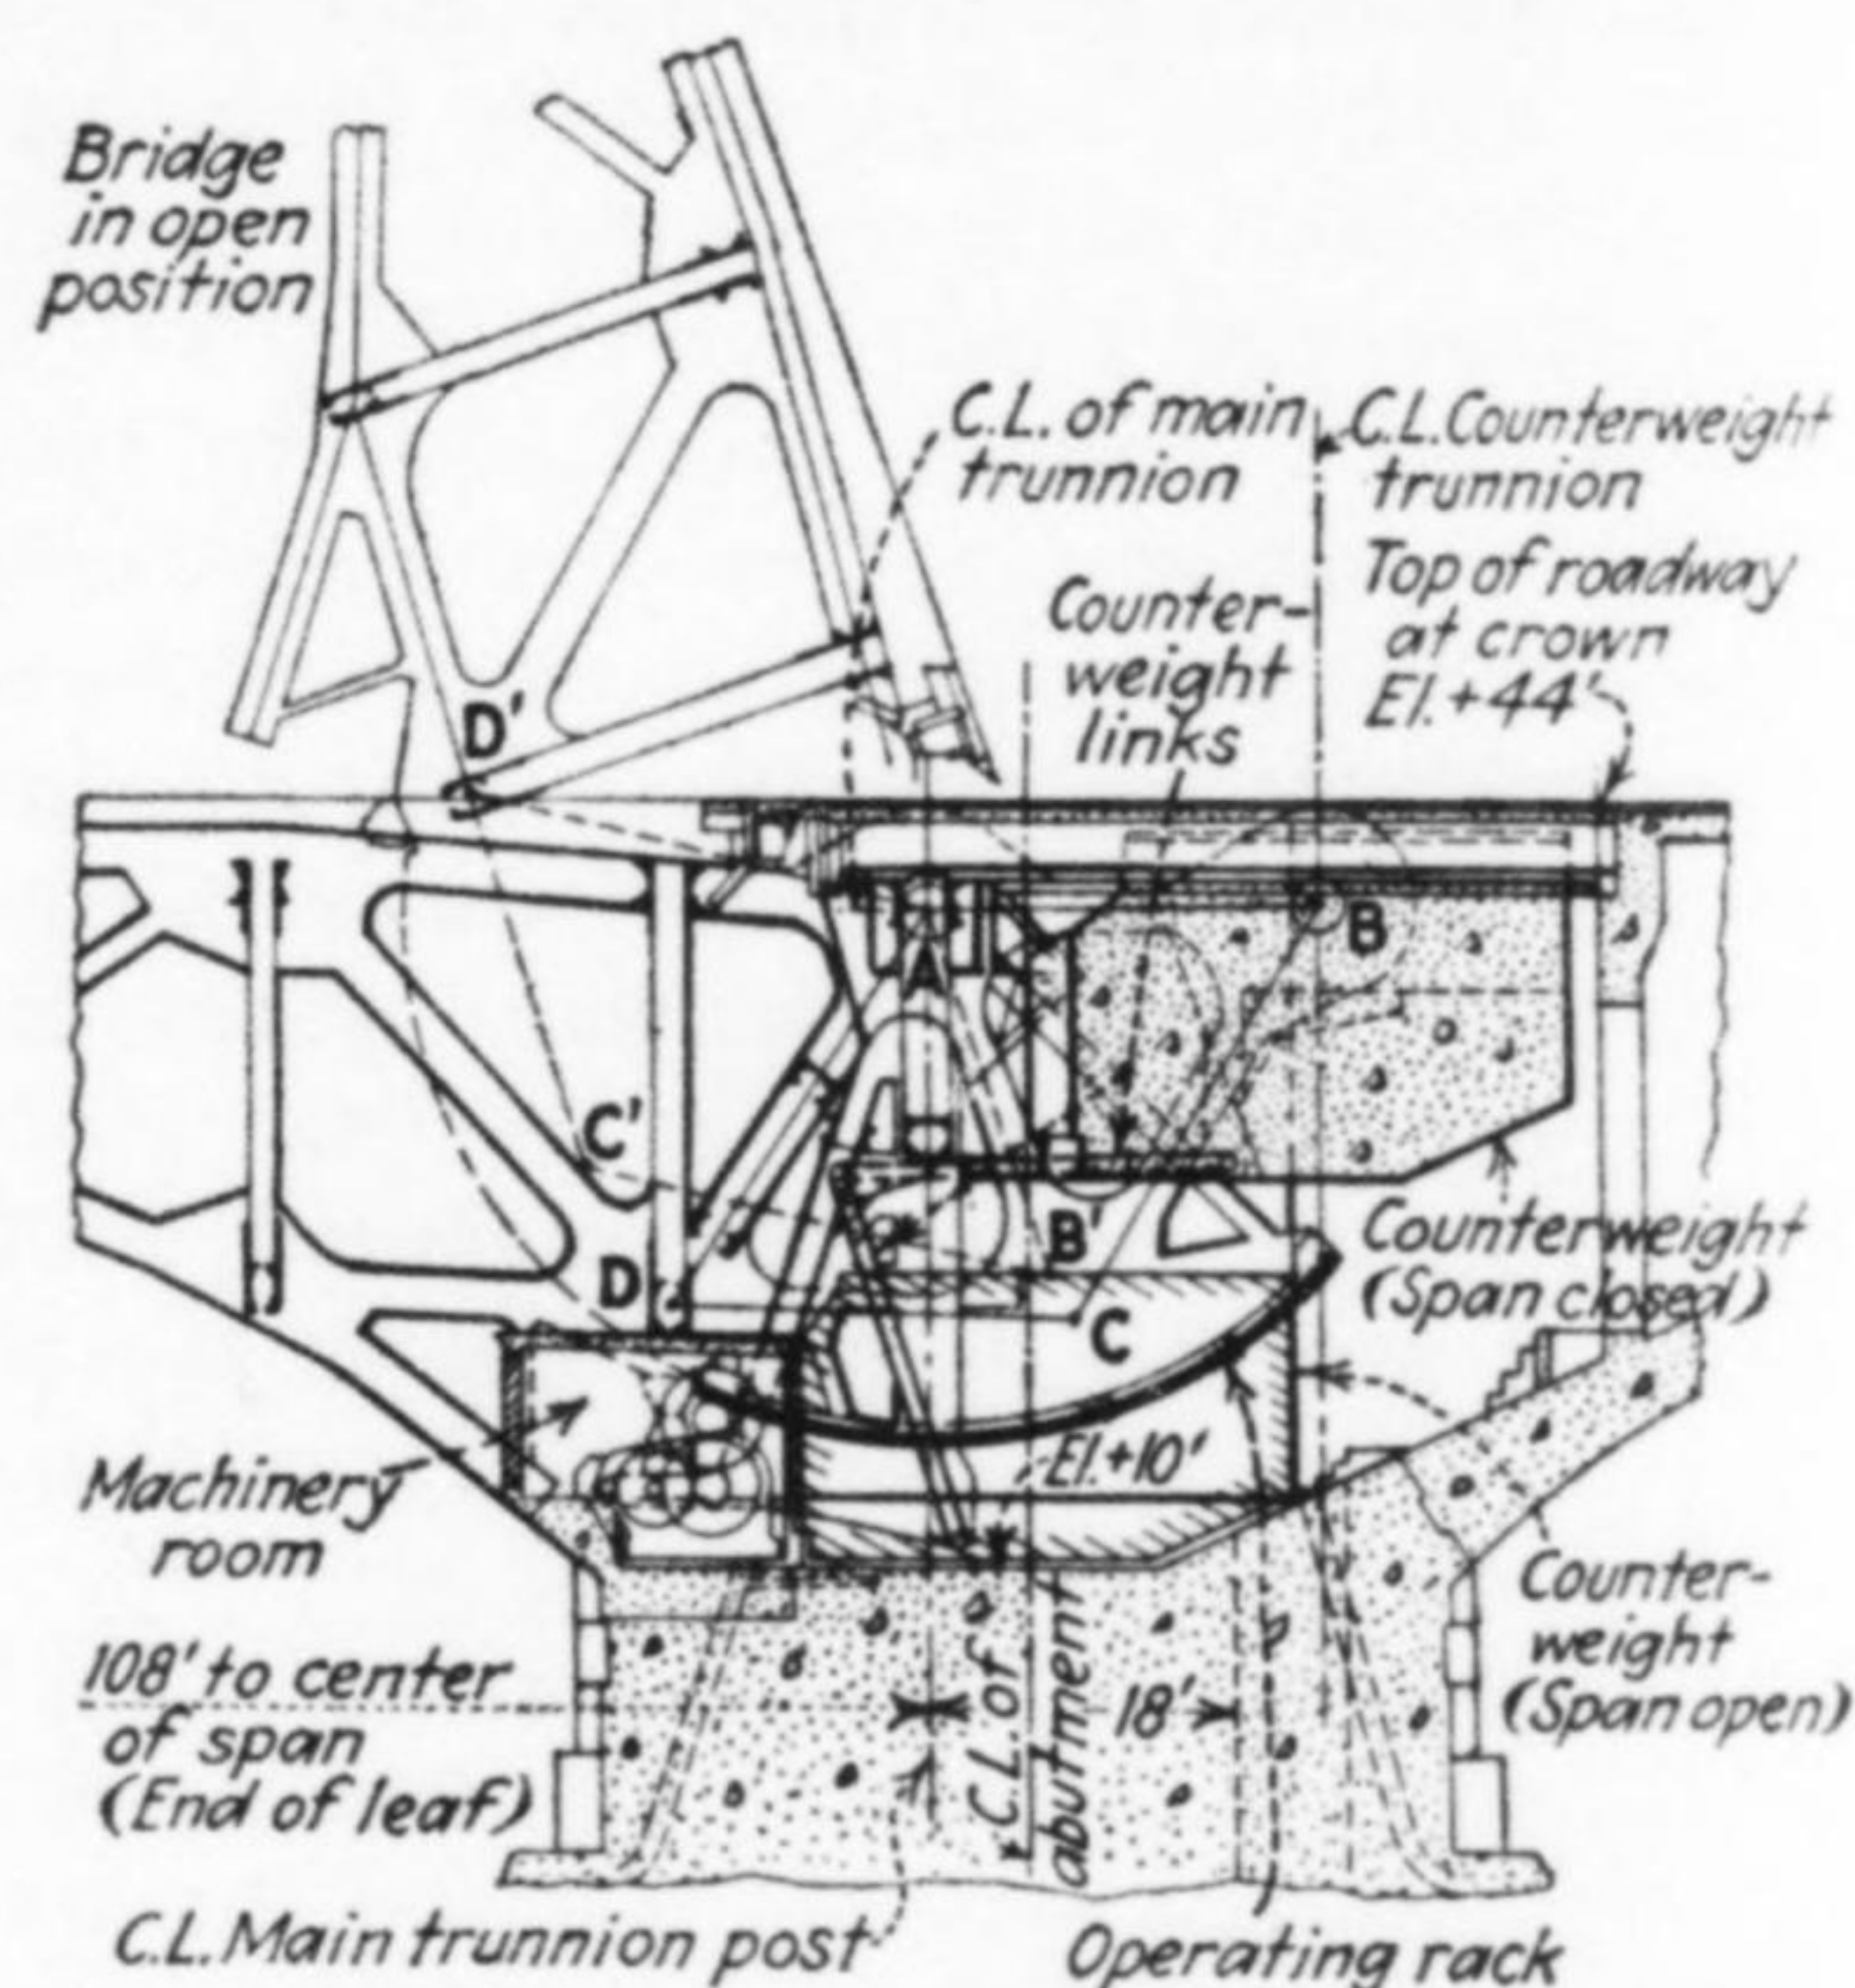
Concrete counterweights, weighing about 2,400 tons each, move downward into a pit under the bridge floor when the 108-ft. leaves are raised.
